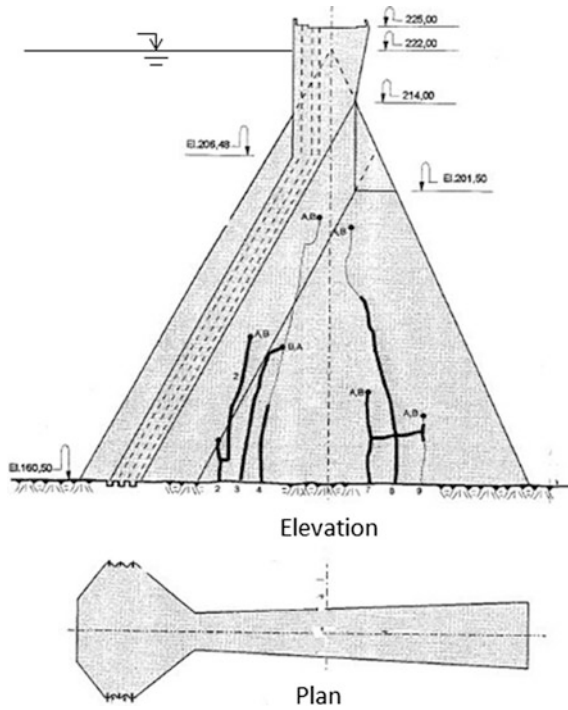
Vertical cracks in the buttress of Itaipu Dam. (Adapted from Betioli et al 1997)
